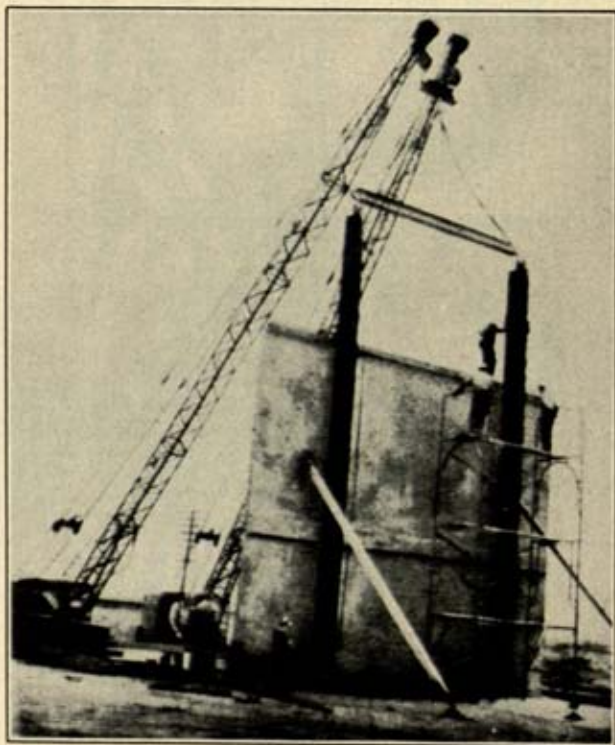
Two cranes working together tilt a panel into position. (*The Constructor*.)
